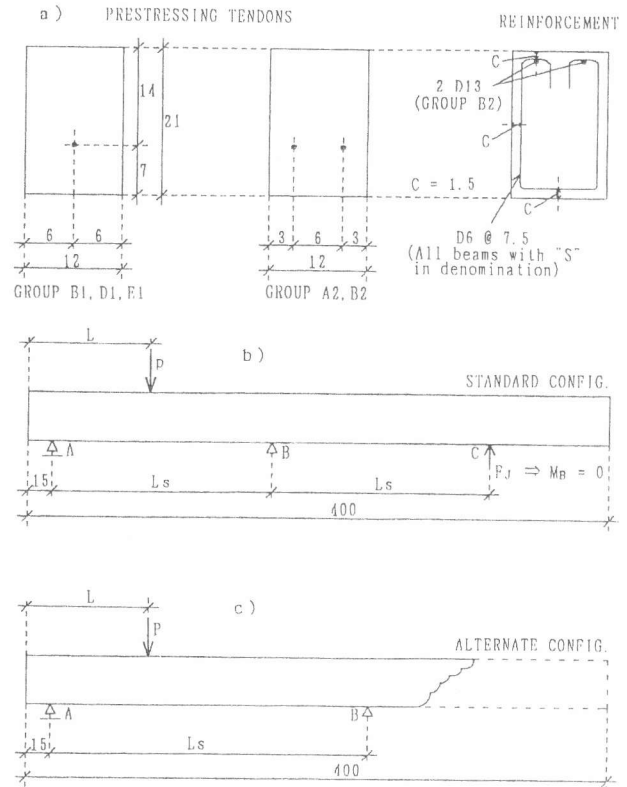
Beam Cross-section Types and Test Set-up Configurations (Dimensions in cm)
